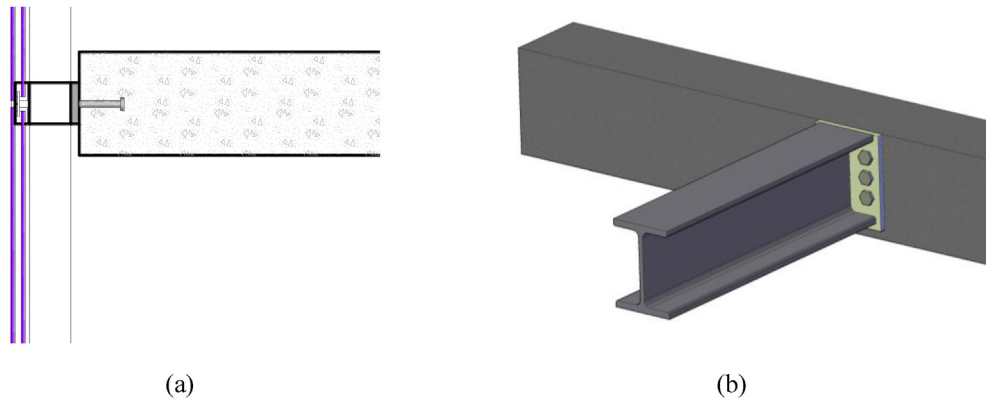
Typical shear-critical connections: (a) curtain wall and (b) connection between steel and concrete beam.
